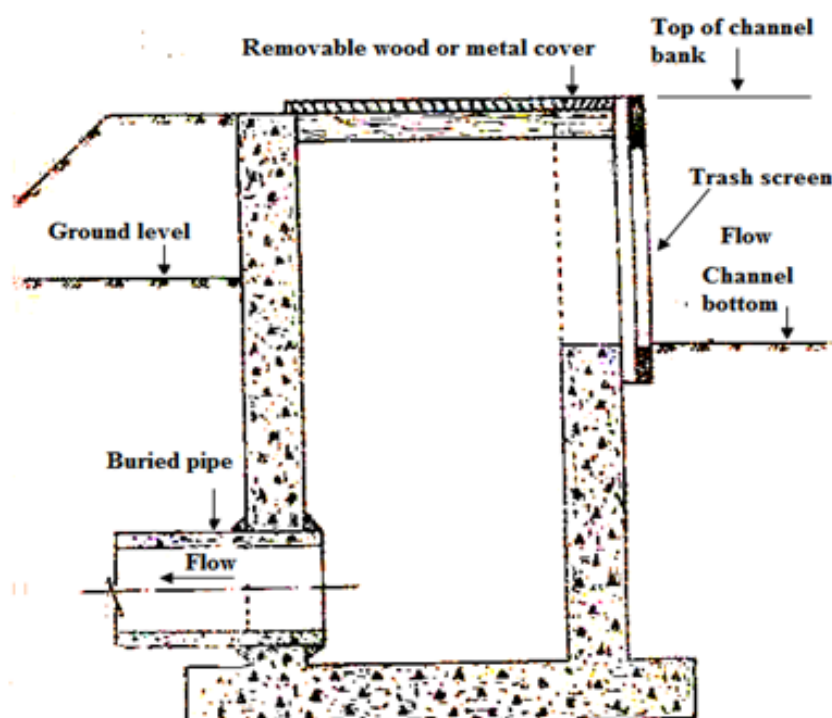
Cross-Section of an inlet taking water from canal into an underground pipeline
